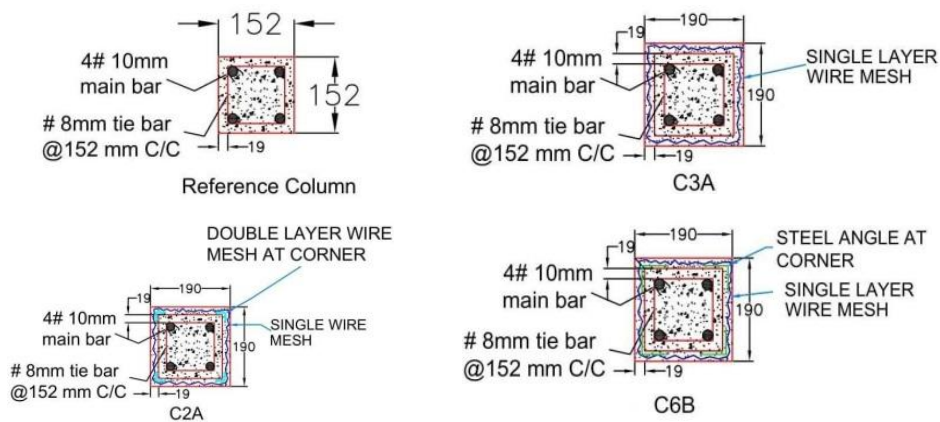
Cross sectional details of four columns (dimensions are in mm)
